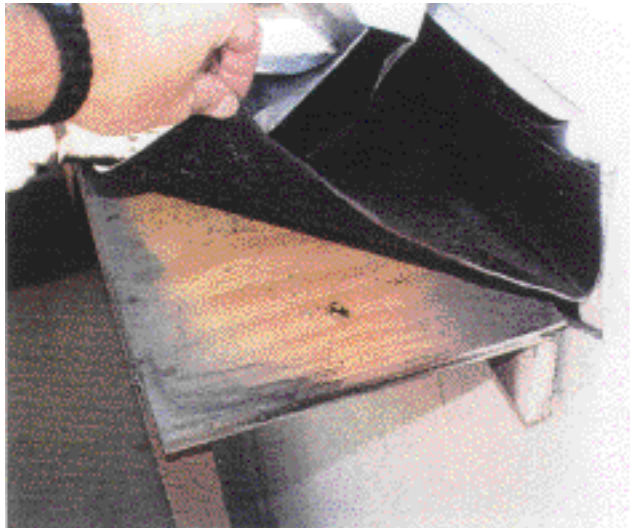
A raised fascia board (illustration) requires a heavy metal flashing or cant strip to ensure that runoff passes over the edge. Otherwise, water will pond, as in the photo, resulting in leaks and rot in the eaves.
